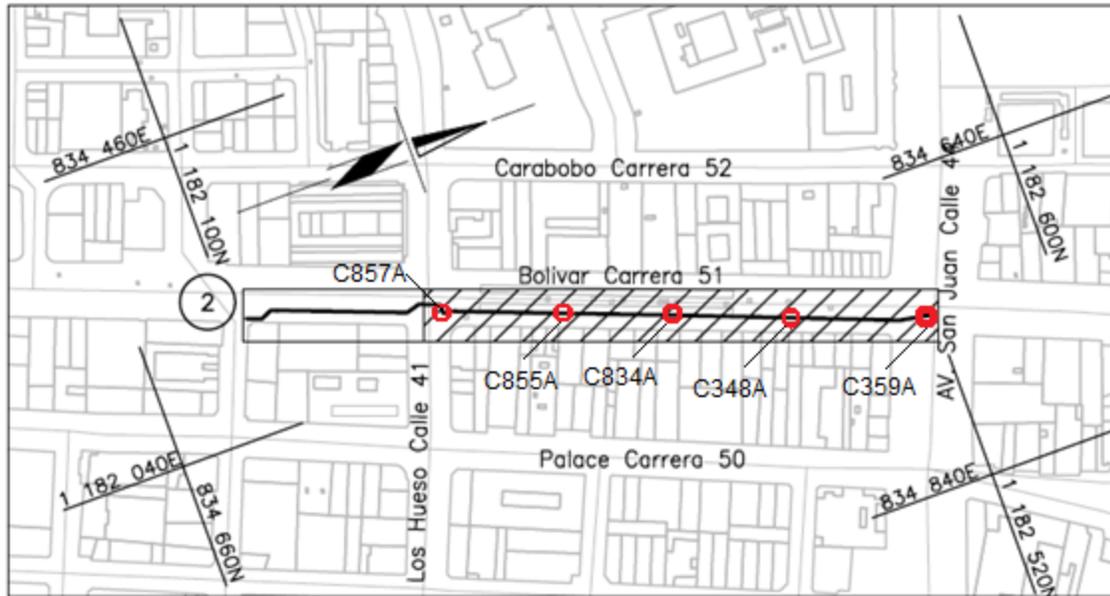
Typical segment of pipe jacking in “Centro Parrilla” Project (EPM-51MED23-07RE-0337, 2013)
